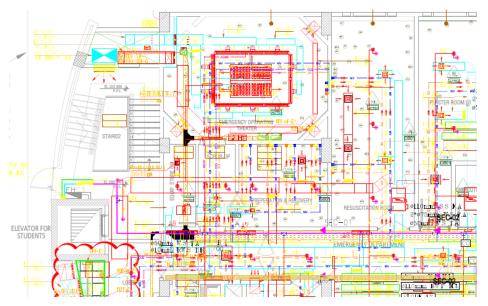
Composite ceiling plan showing all systems used in the emergency zone.
